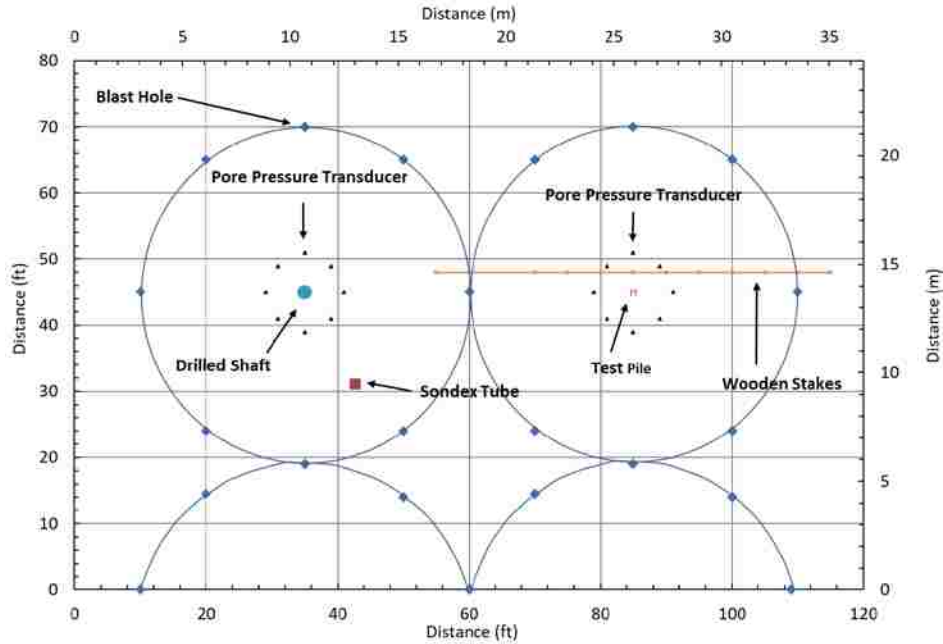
Plan view drawing for a typical test blast showing drilled shaft and driven test piles, blast holes, and instrumentation.
